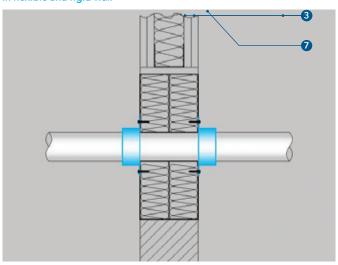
Insulated metal pipe penetrating seal in flexible and rigid wall
